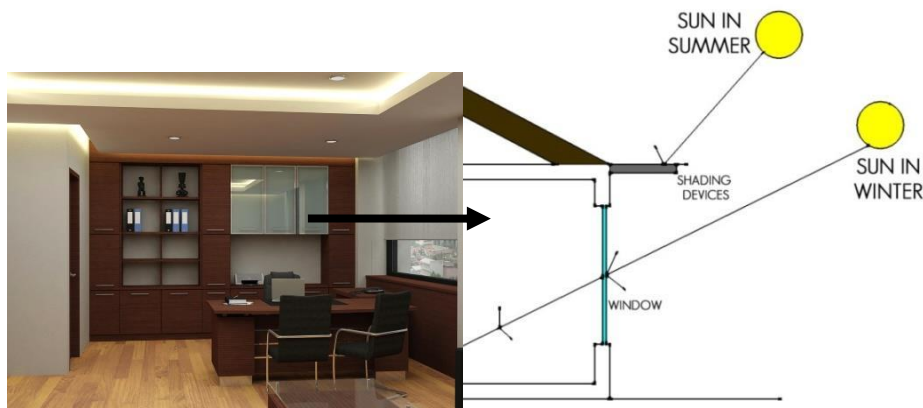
Workspace with Sunlight Openings (Source: Private Document)
